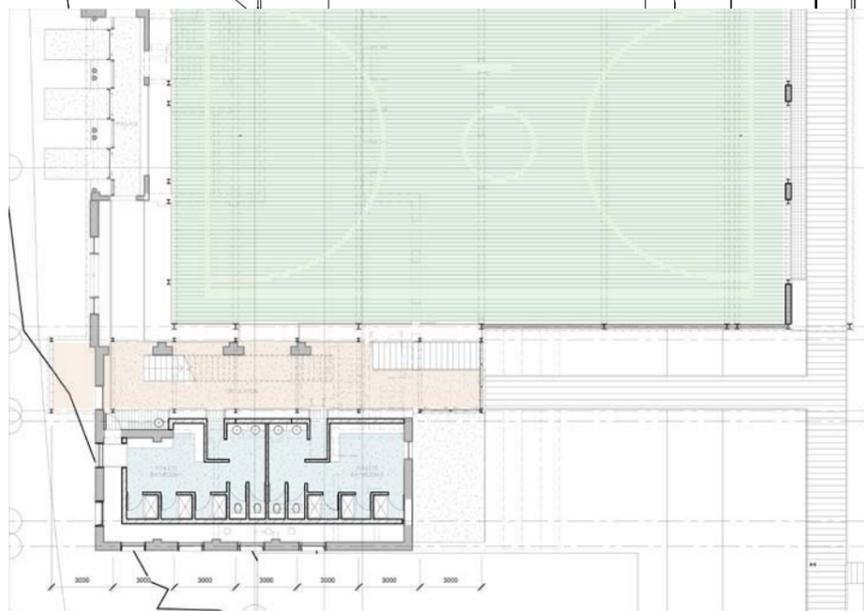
Part of street level plan with coloured zones (Author September 2013)
